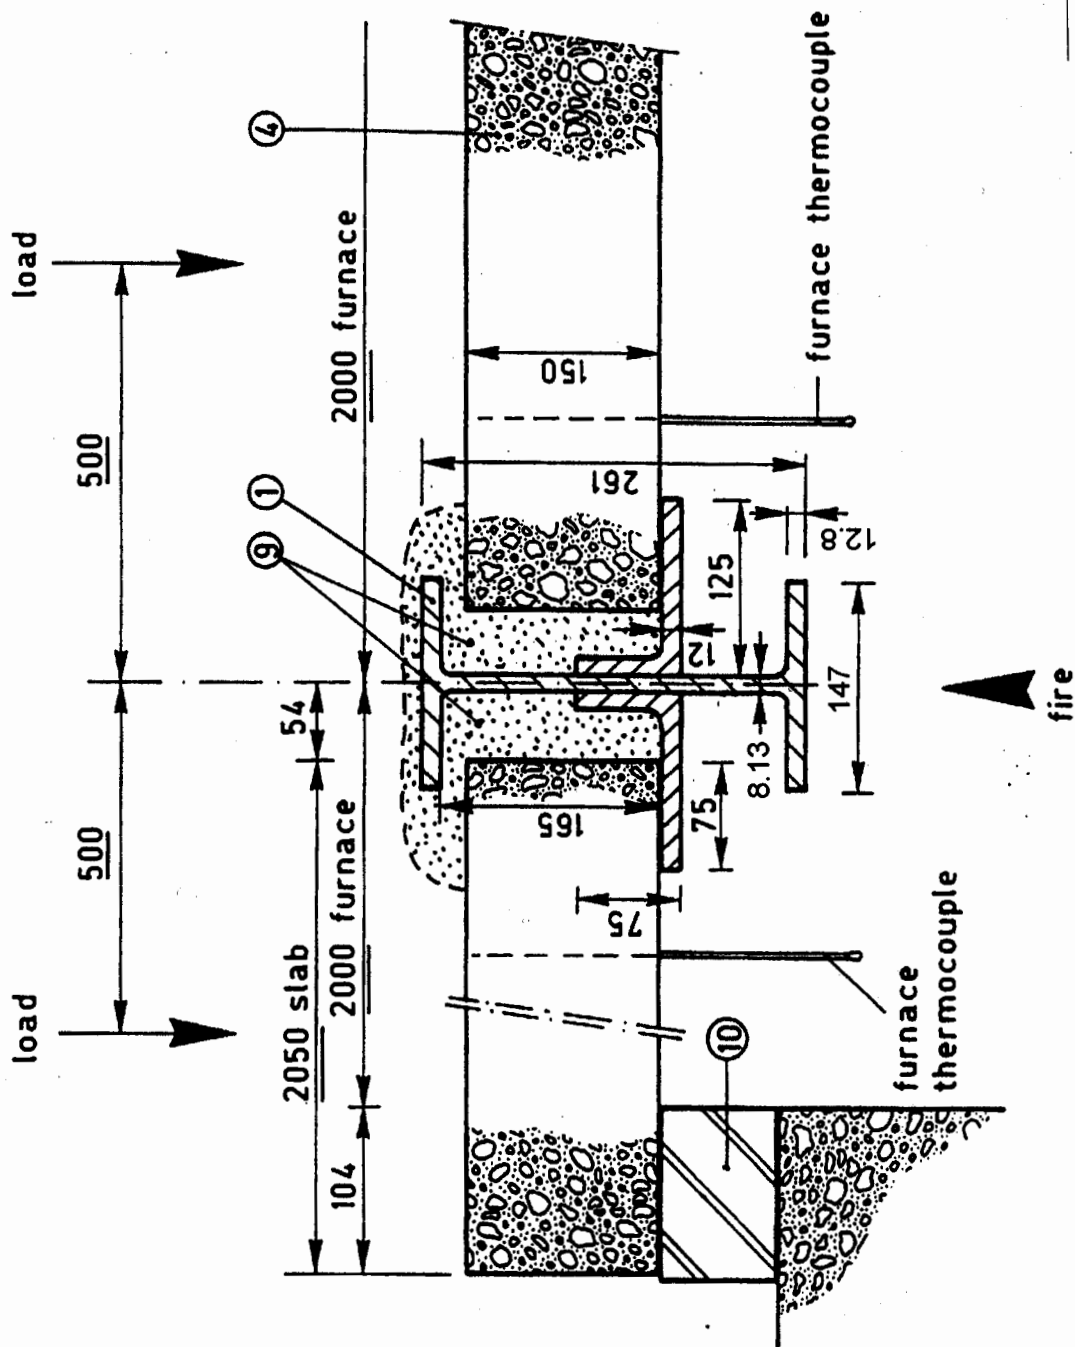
DESIGN DETAILS OF THE REINFORCED CONCRETE FLOOR UNITS FOR USE WITH THE SHELF ANGLE FLOOR BEAM TEST NO. B-89-724B (D0992C06)
